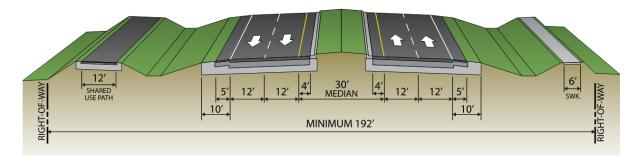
Preferred Alternative Typical Section from Stacy Road to SR 56
